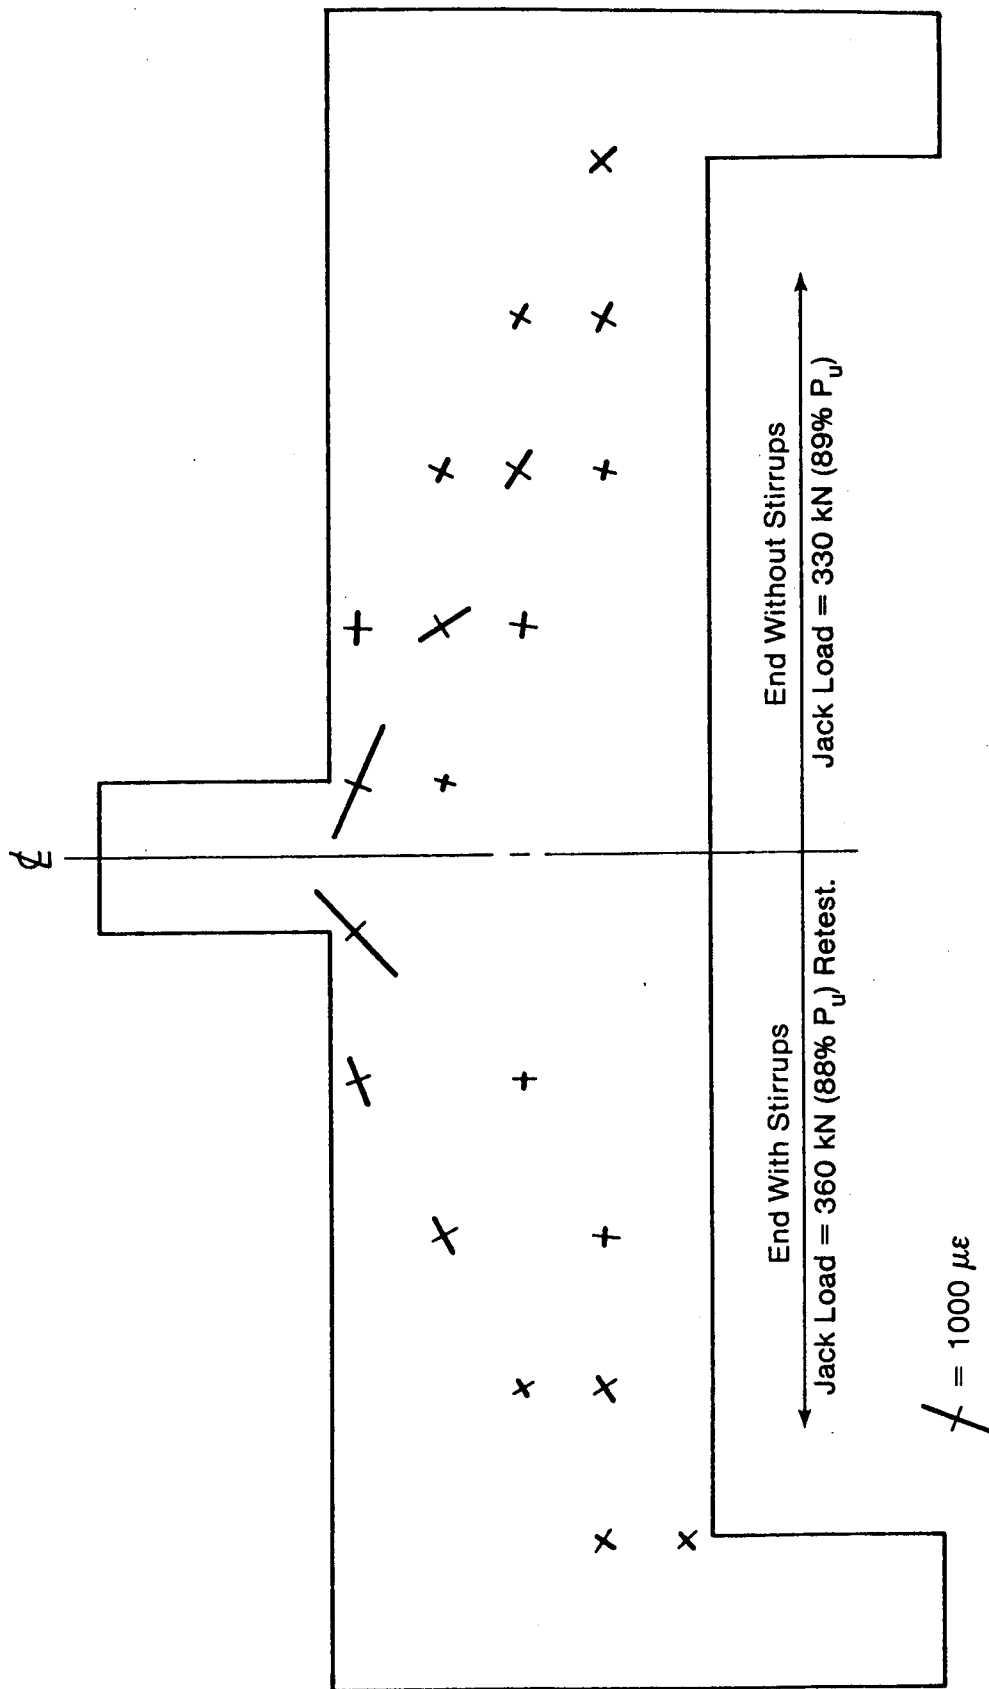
Beam 2/2.0 Concrete Compressive Strains
